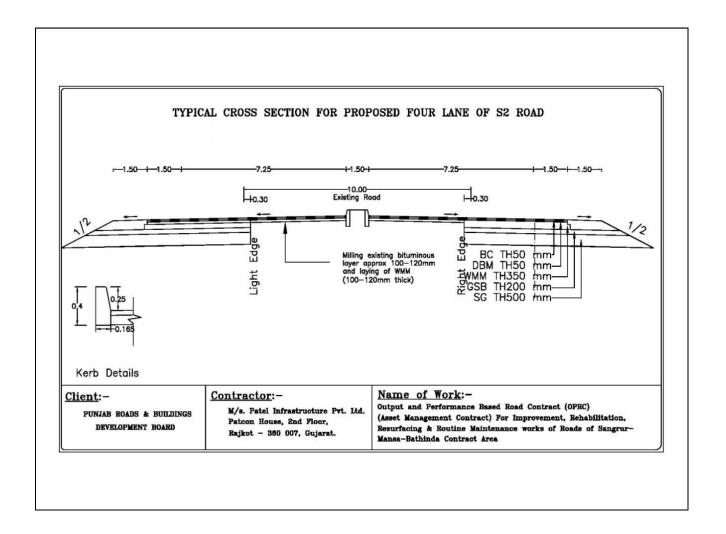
Typical X-SECTION OF 4 lane sections of S2 and S3
